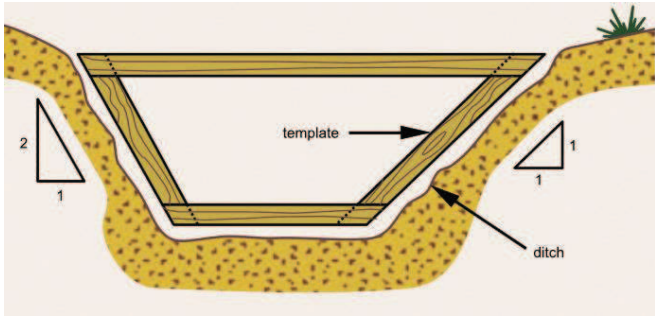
Trapezoidal ditch template according to final required profile, made of timber (ILO, 2008).
